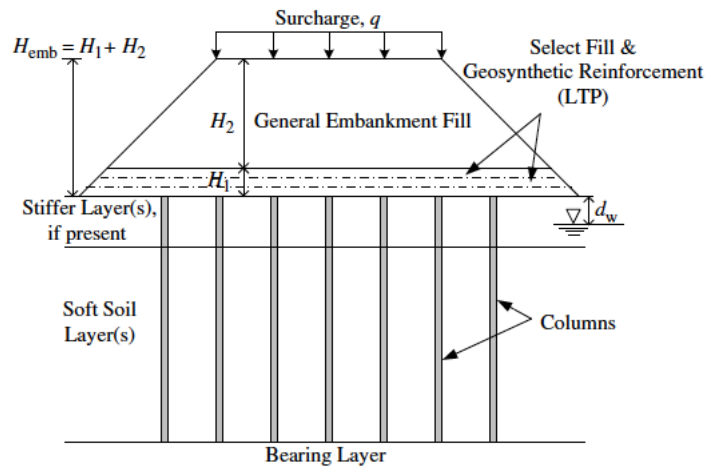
Column-supported embankment with geosynthetic reinforcement (Filz et al. 2019).
